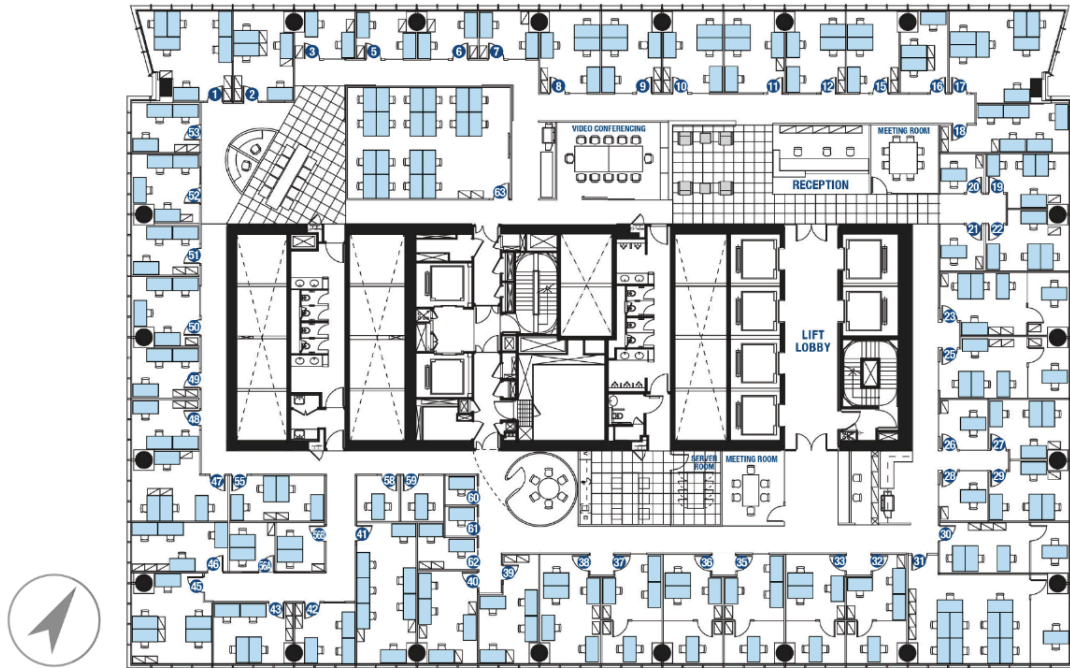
Case study: Plan of the 25th floor of One Raffles Quay. Source: <https://www.mondestay.com>
